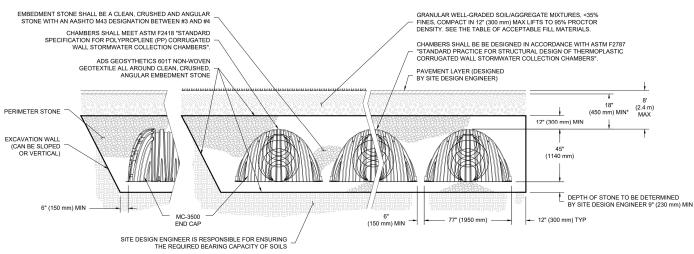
A - MC-3500 Structural Cross Section Detail (Not to Scale)
